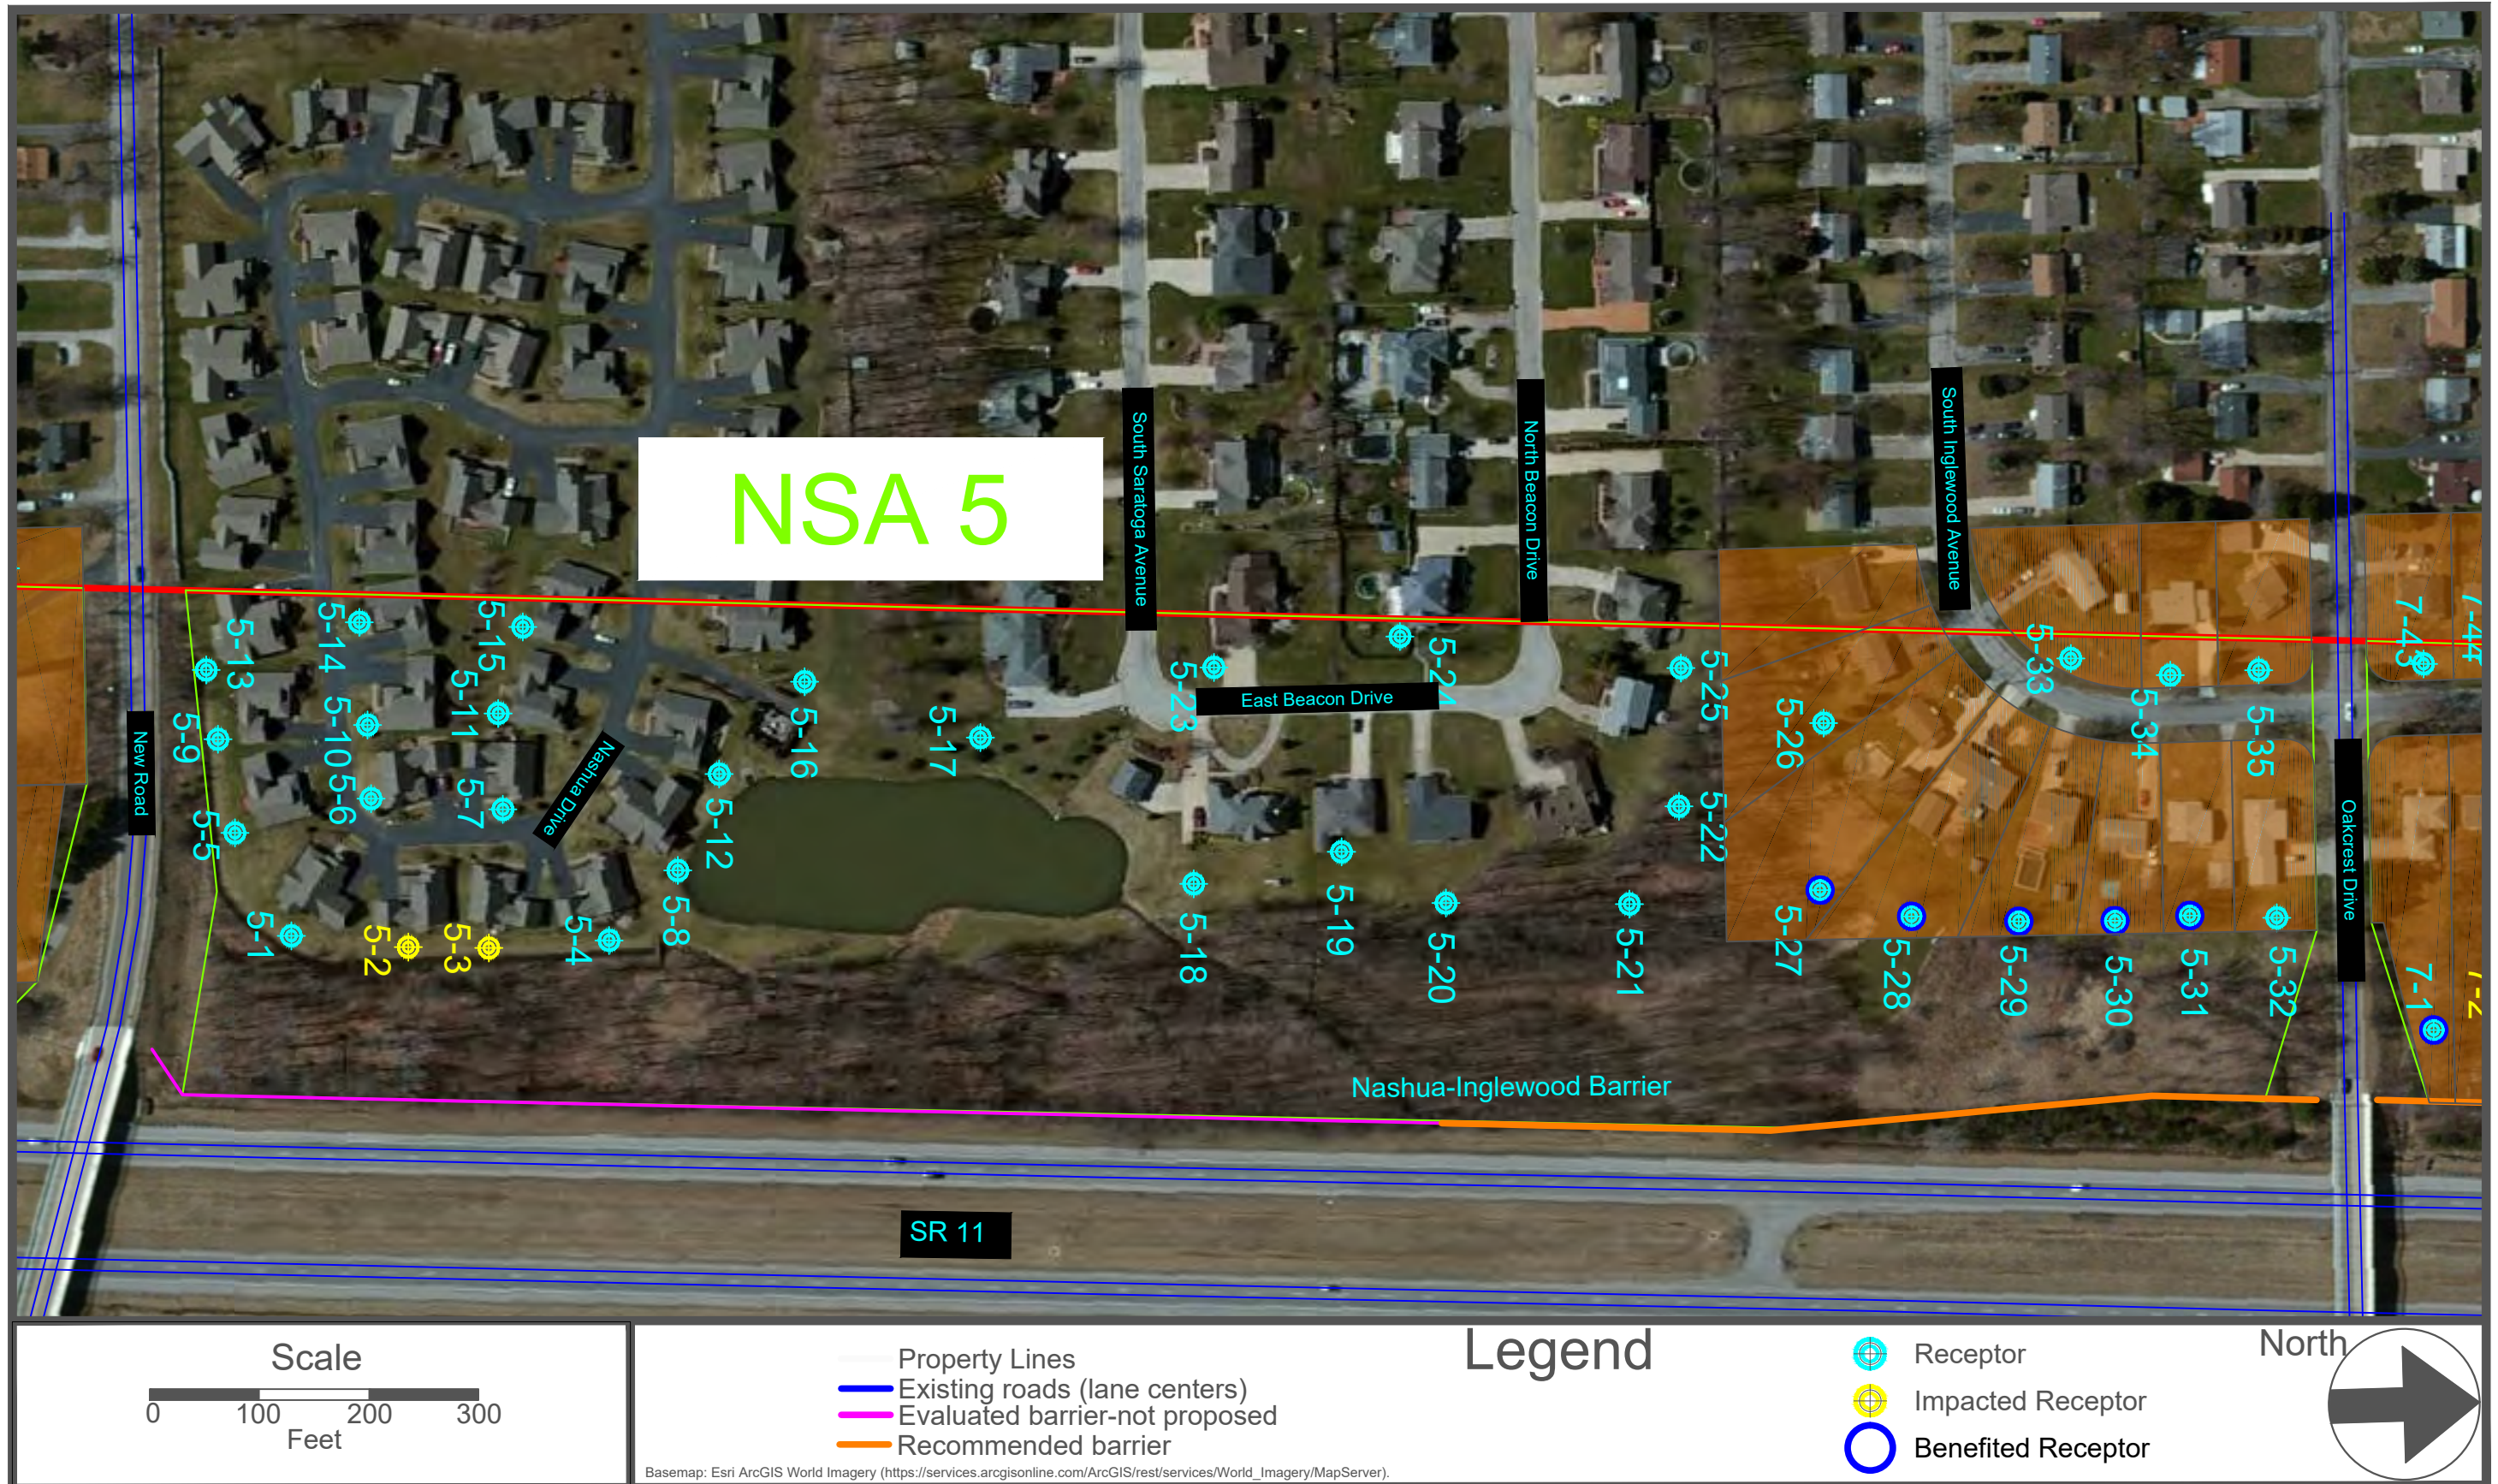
Proposed Nashua-Inglewood Barrier (Sheet 1 of 3).
